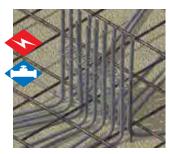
Stiffy Back-toBack Slab-on-Grade Trapeze
